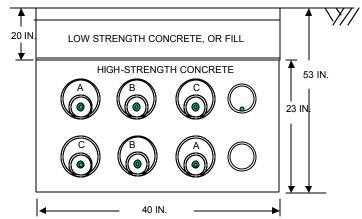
Trench cross section of 345-kV XLPE cable system, horizontal configuration, with two cables per phase
